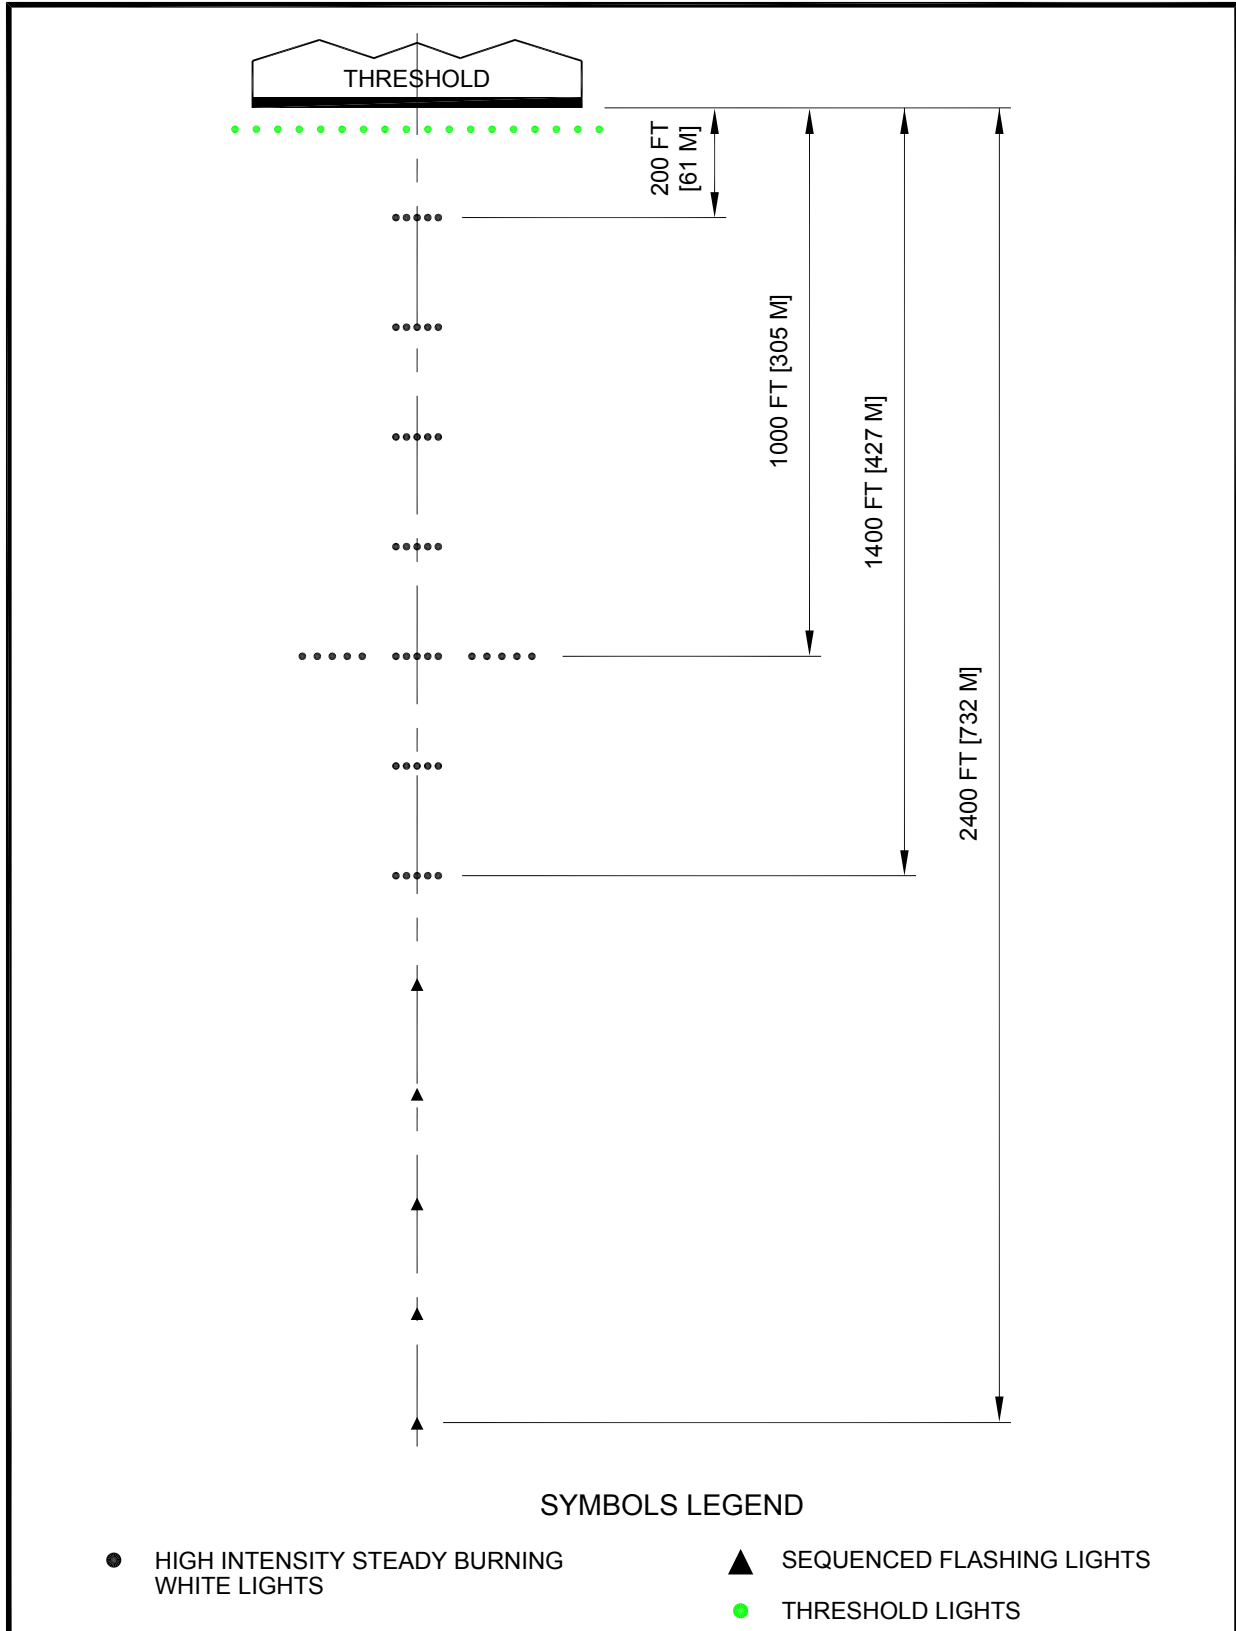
Simplified Short Approach Light System with Runway Alignment (SSALR)
